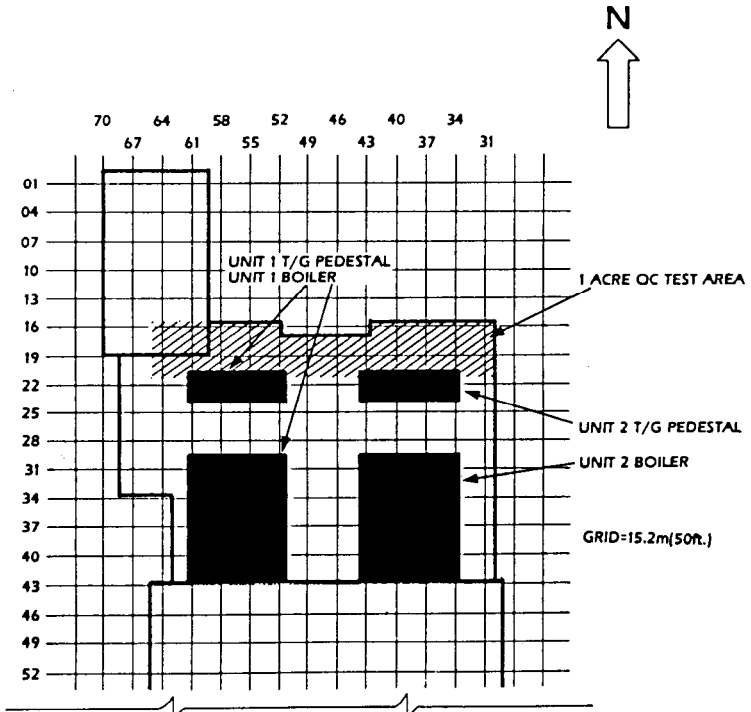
PLAN OF THE NORTH HALF OF THE POWER BLOCK GROUND IMPROVEMENT AREA, INCLUDING THE TEST AREA AND TYPICAL STRUCTURES WITH SETTLEMENT MEASUREMENTS (Fig. 9)
